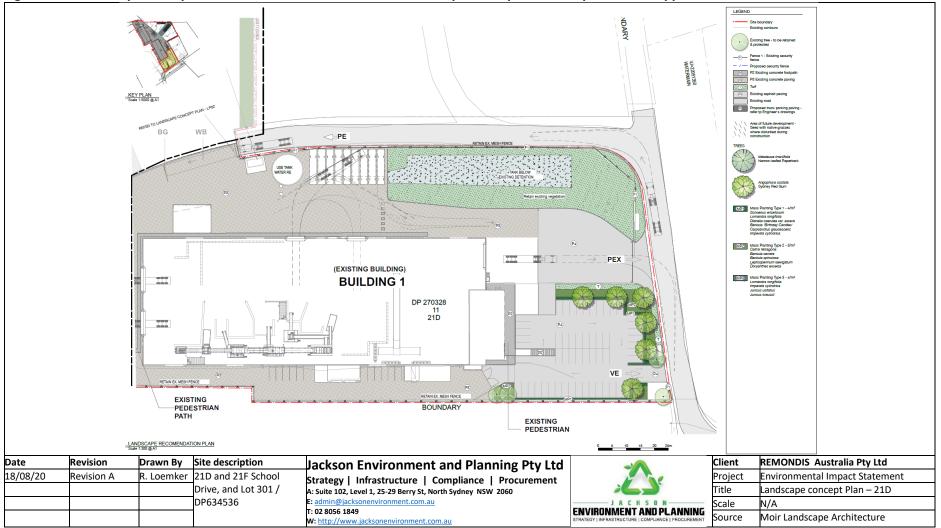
Landscape concept Plan – 21D School Drive. Detailed Landscape Concept Plans are provided in Appendix R.
